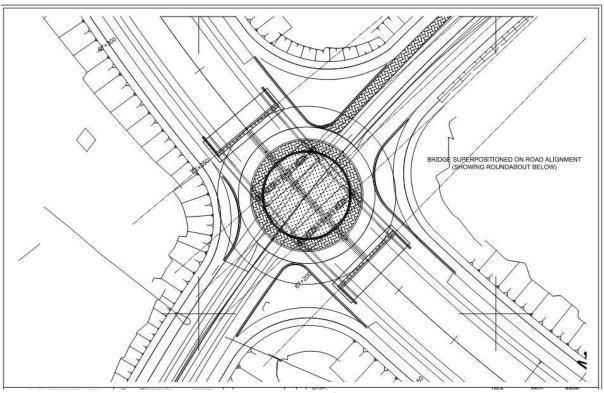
Bridge on Asikuma Jn Interchange CH. 67+ 200 for Section 3 Project Road
